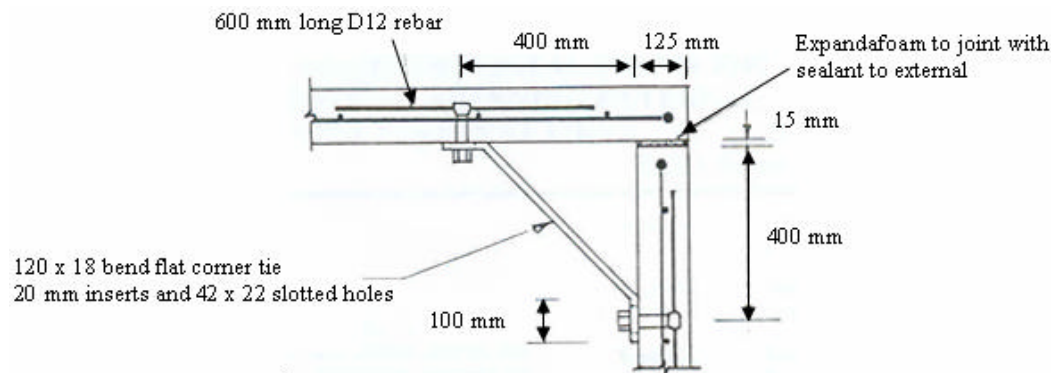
Connection detail between side wall and end wall (Clifton and Forrest, 1996)
